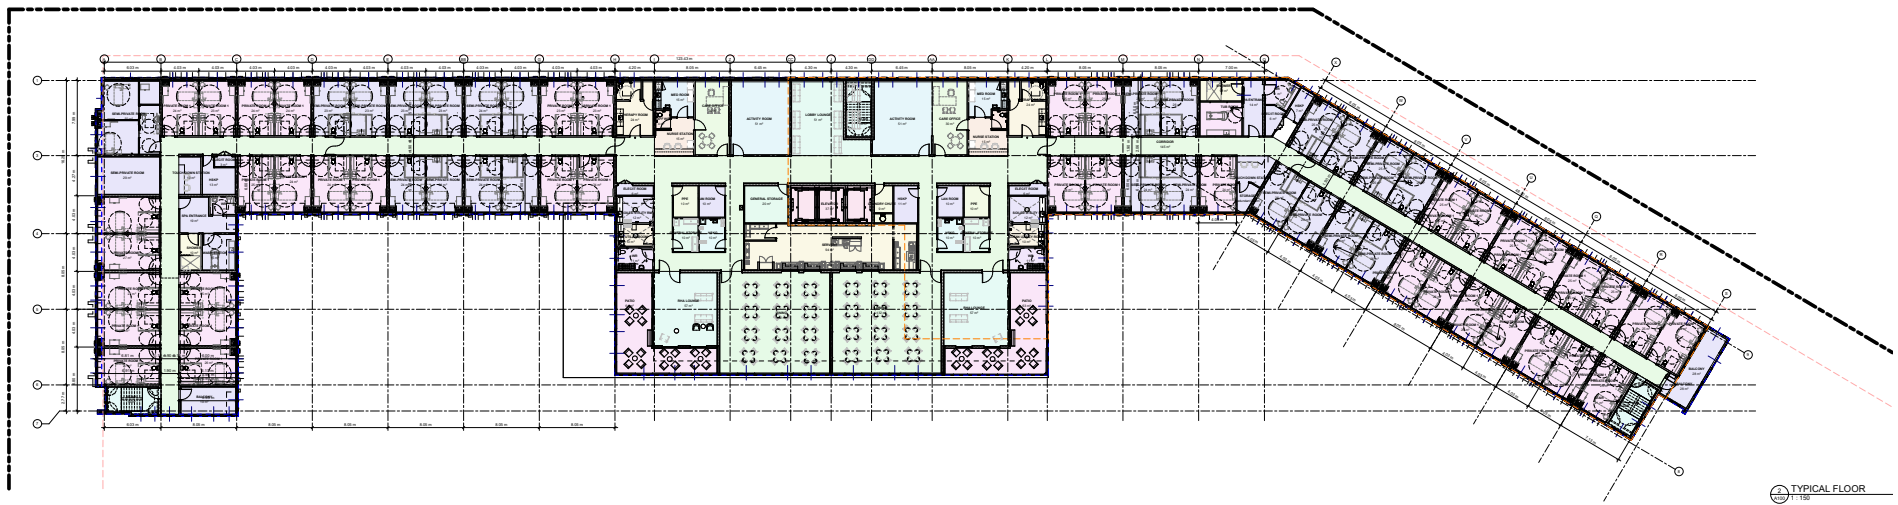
TYPICAL FLOOR PLAN (CHAMBERLAIN ARCHITECT SERVICES LTD.)
